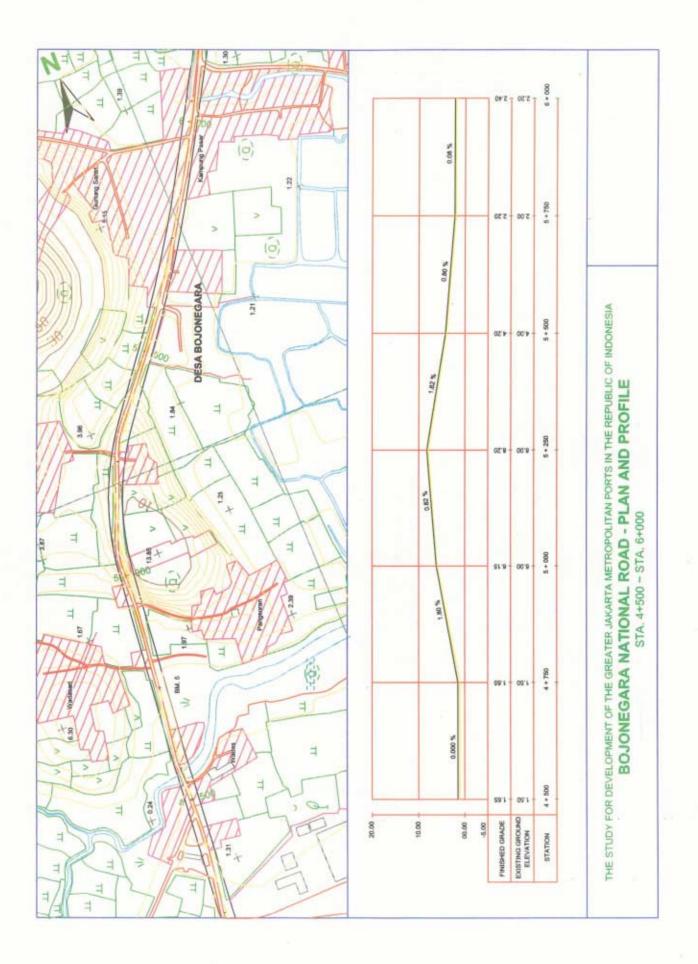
C-14 Bojonegara National Road Plan and Profile (9)
